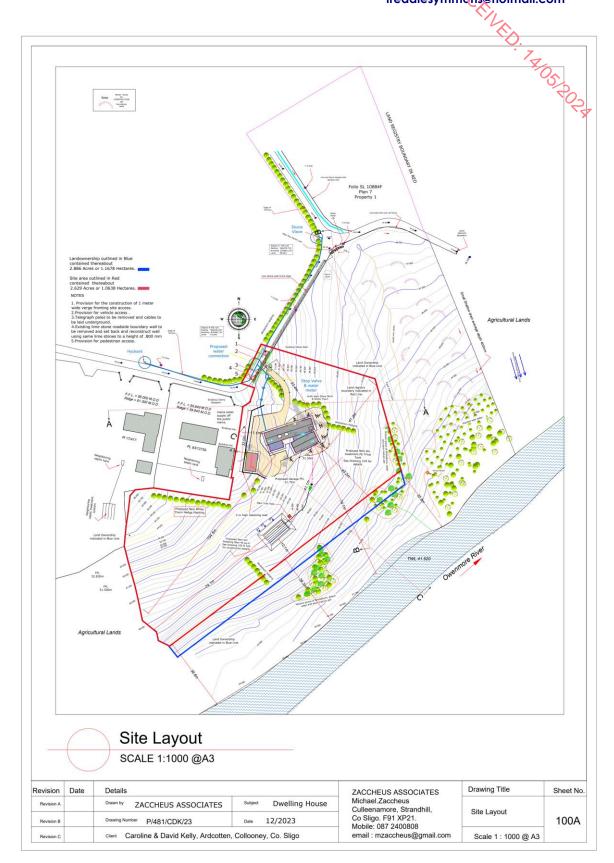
Proposed Site Layout Plan (Source: Zaccheus Associates)
